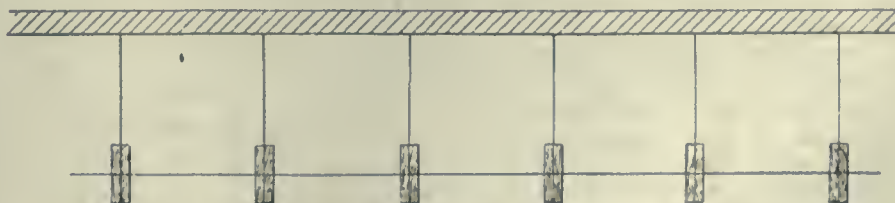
LAYING DOWN CENTRES FOR WALL BRACKETS ON FLOOR.
